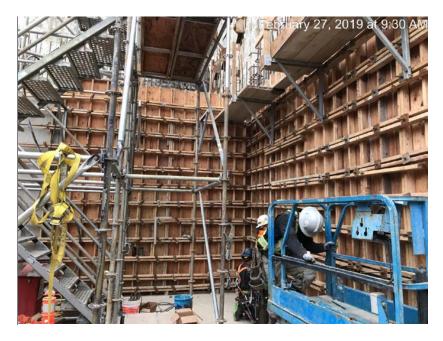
Clover Point Pump Station: pump room wall 4 formwork being completed.
